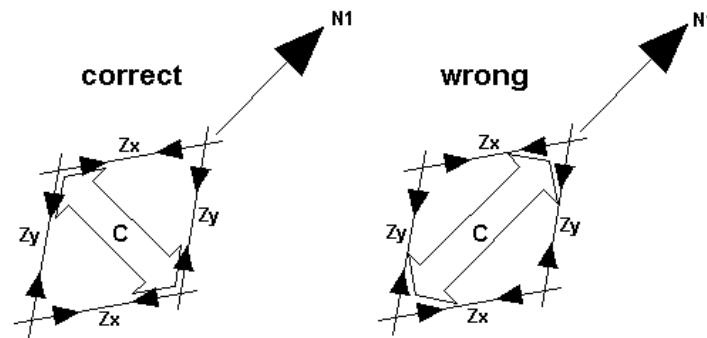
Correct and incorrect arrangement of the stiffening concrete compression strut
